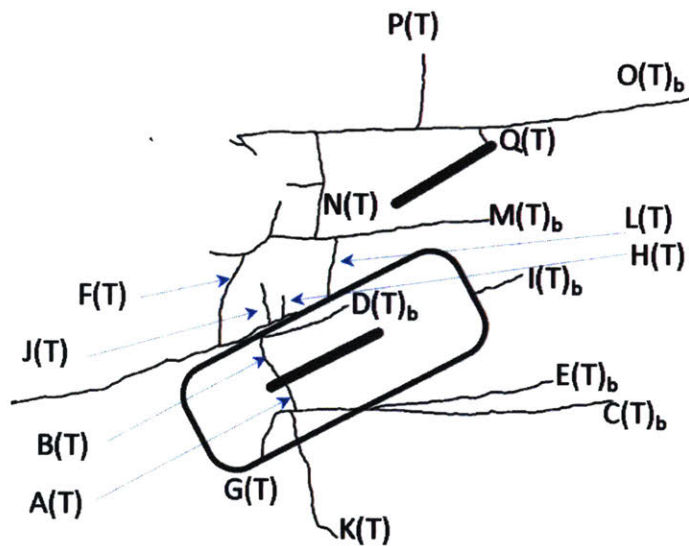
Final sketch of specimen OP-HF-2a-30-60-B
